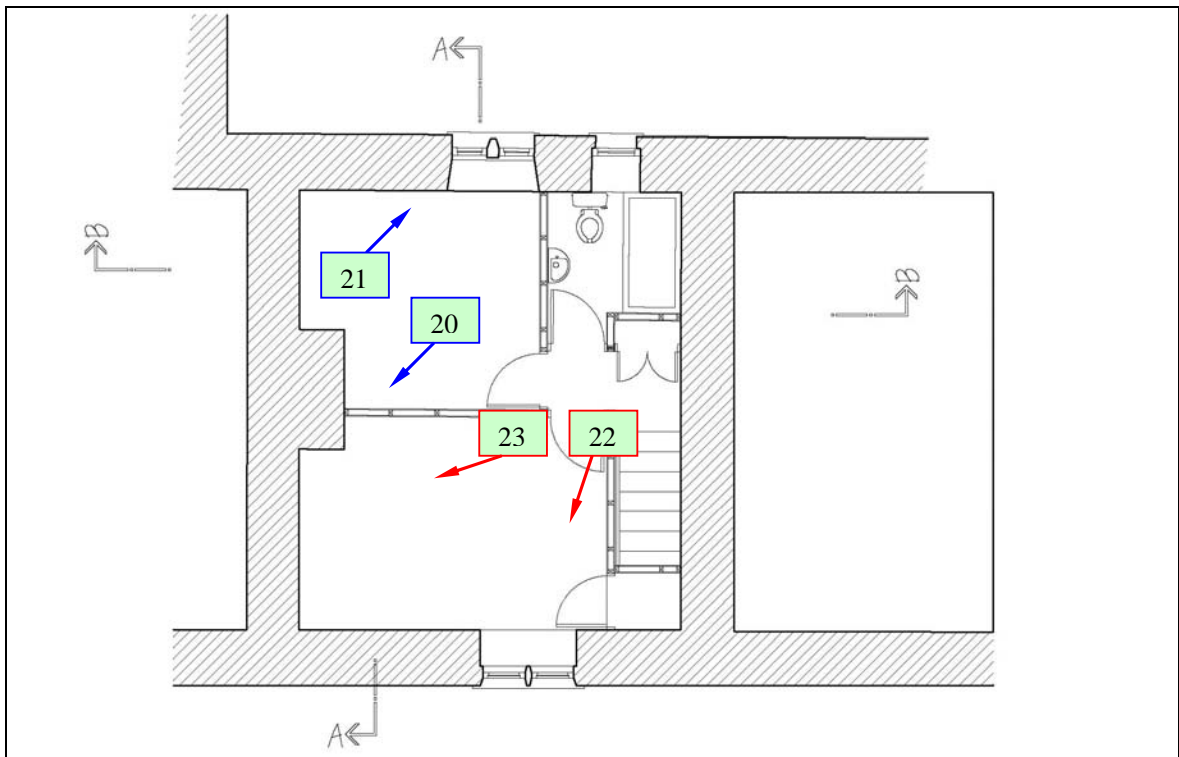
First floor viewpoints; attic viewpoints above in red. (Anthony Flanagan)
